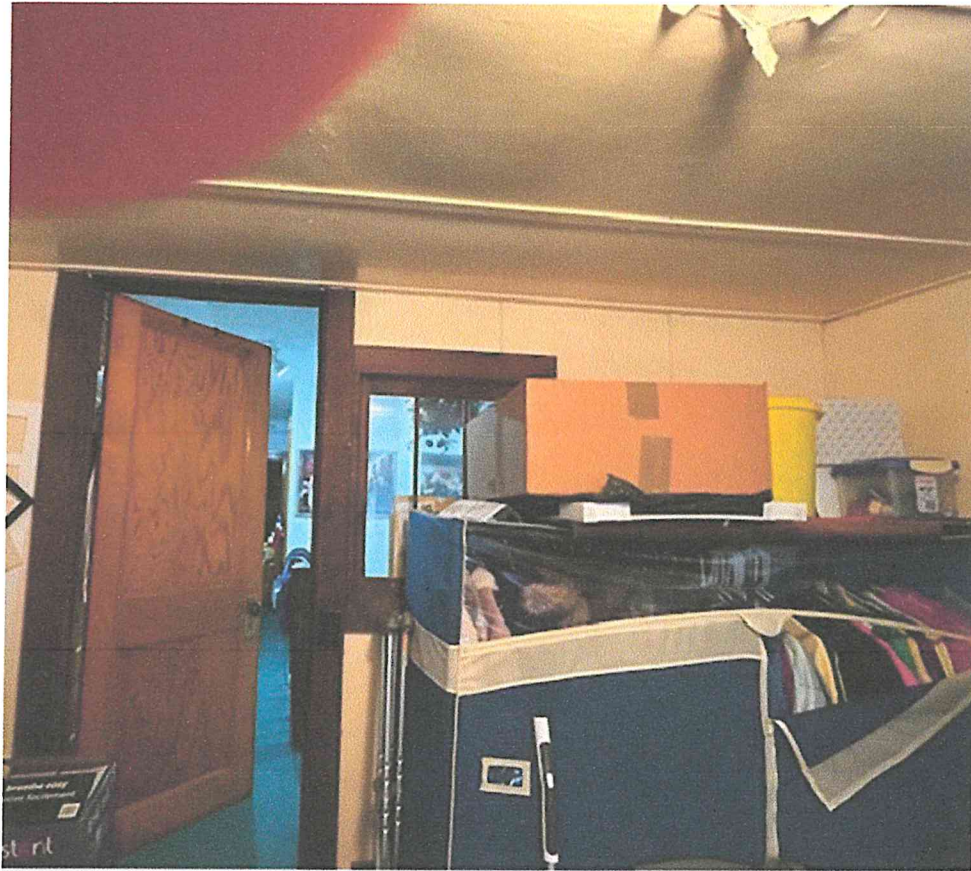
Looking at South interior wall of porch located on main house at 805 4th Street
